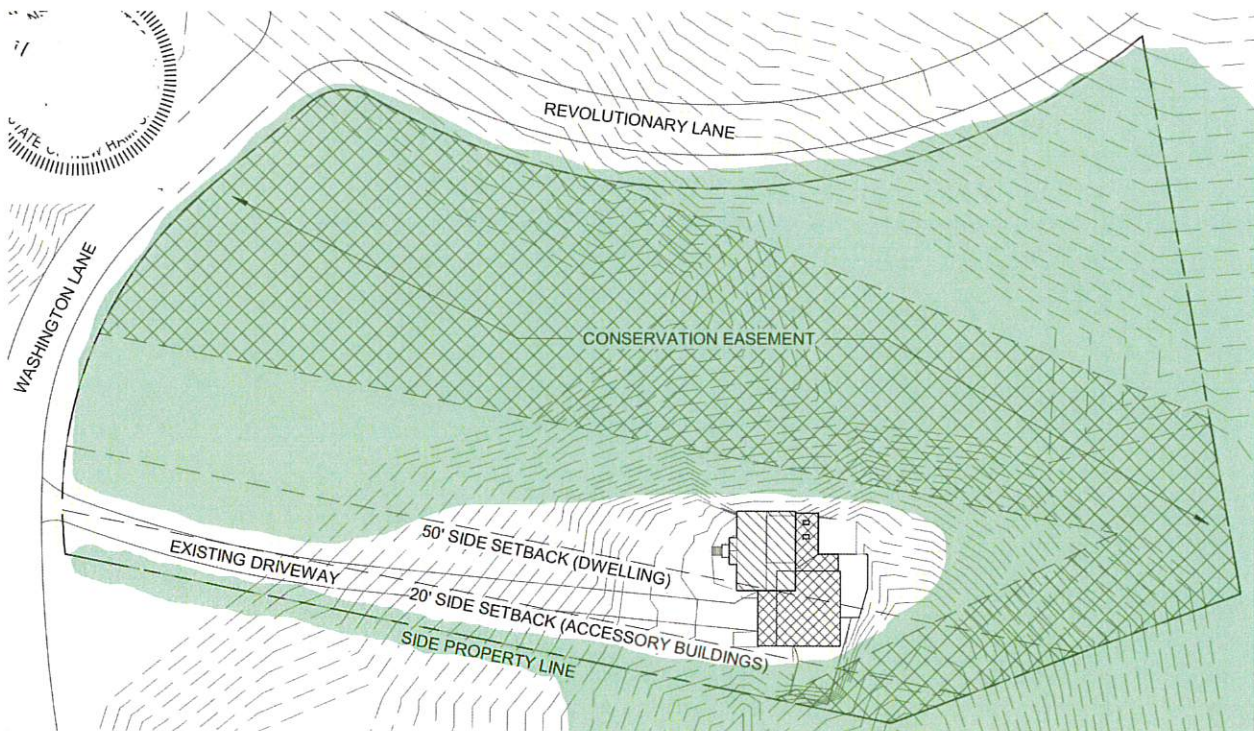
Site plan, showing heavily forested area (green), conservation easement (crosshatched), and severe slop (dashed contours). The proposed site is the only suitable building location on the lot.
